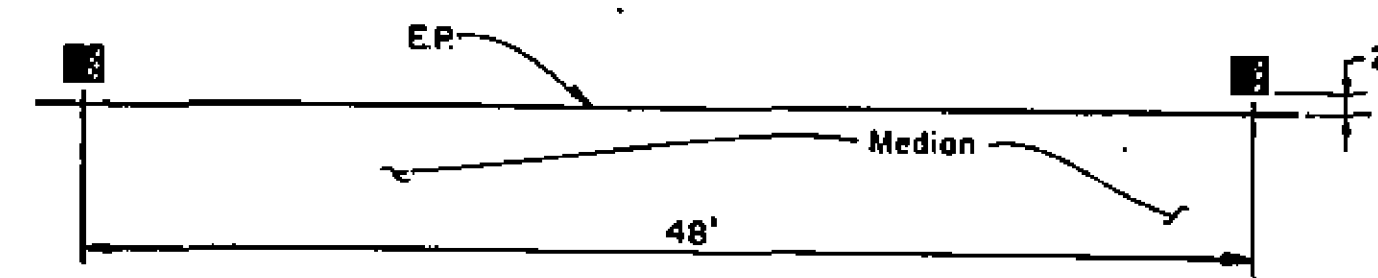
ONE-WAY NO PASSING ZONE WITH PAINTED STRIPE
